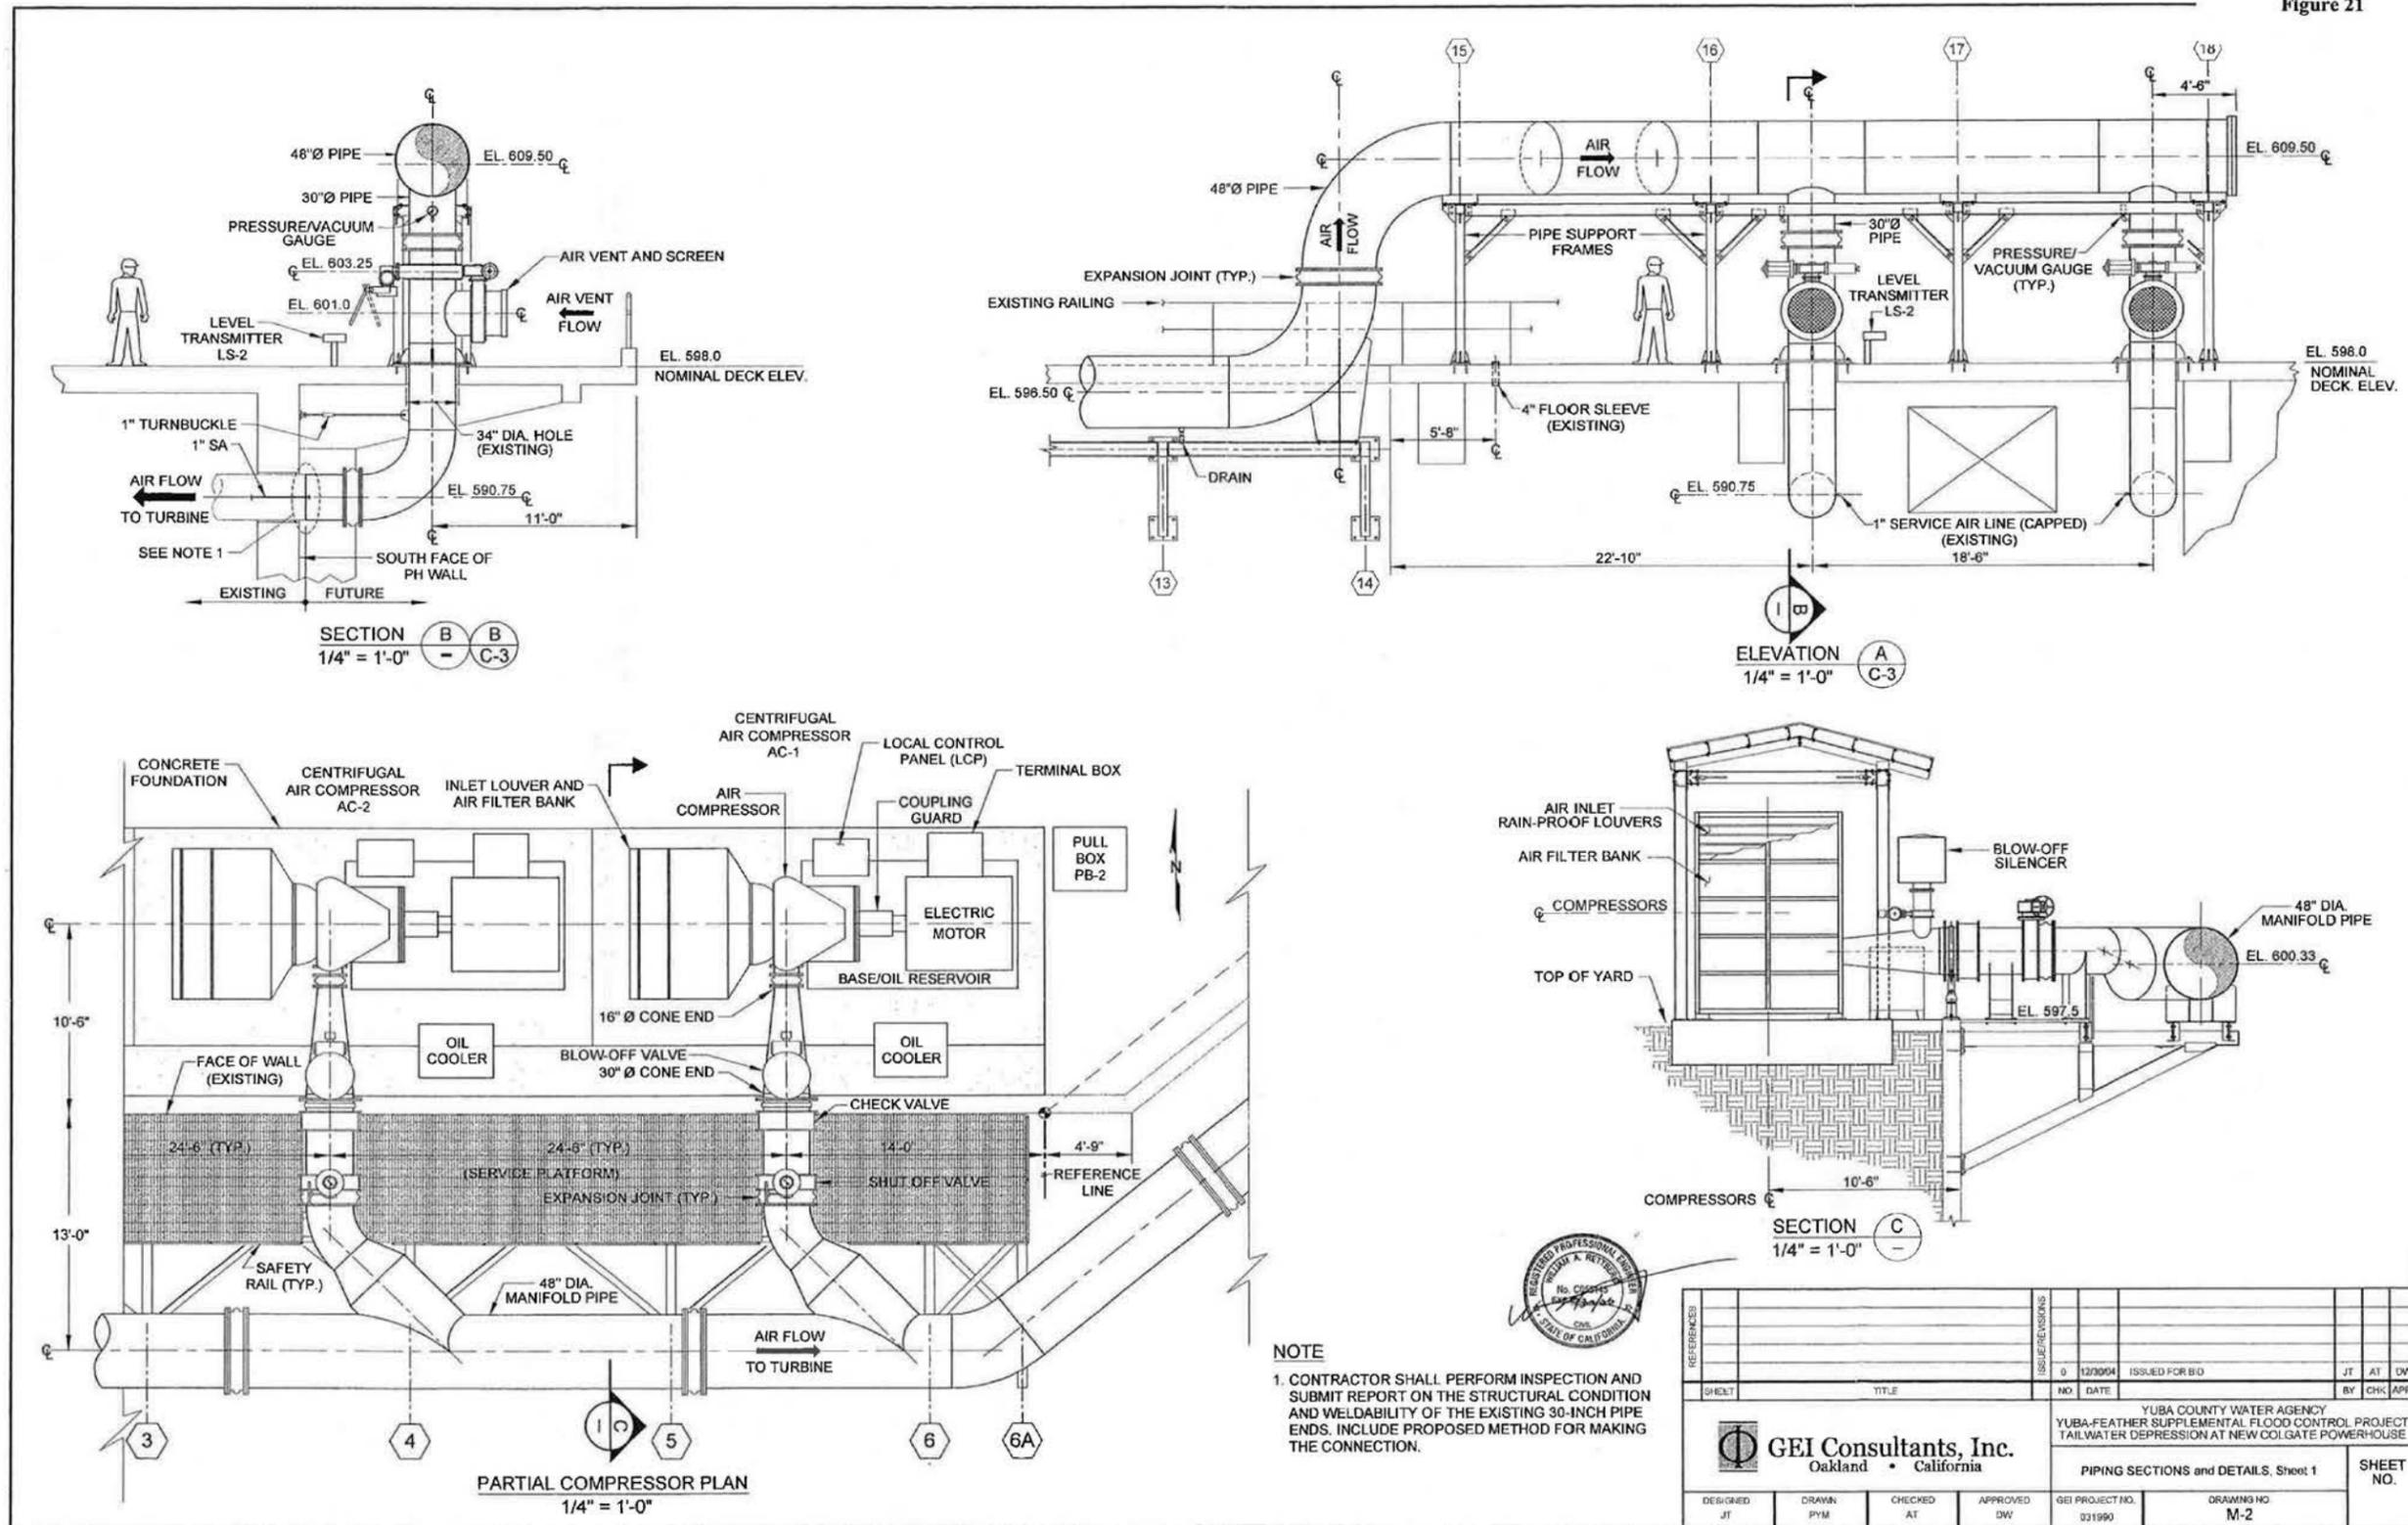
Piping sections and details for YCWA's proposed New Colgate Powerhouse TDS.
